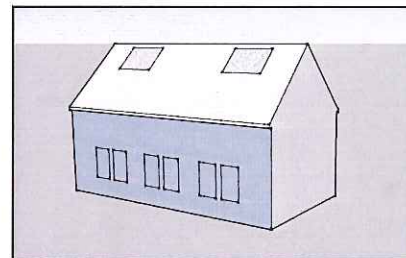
Panels placed on upper 2/3 of roof and aligned with windows.
